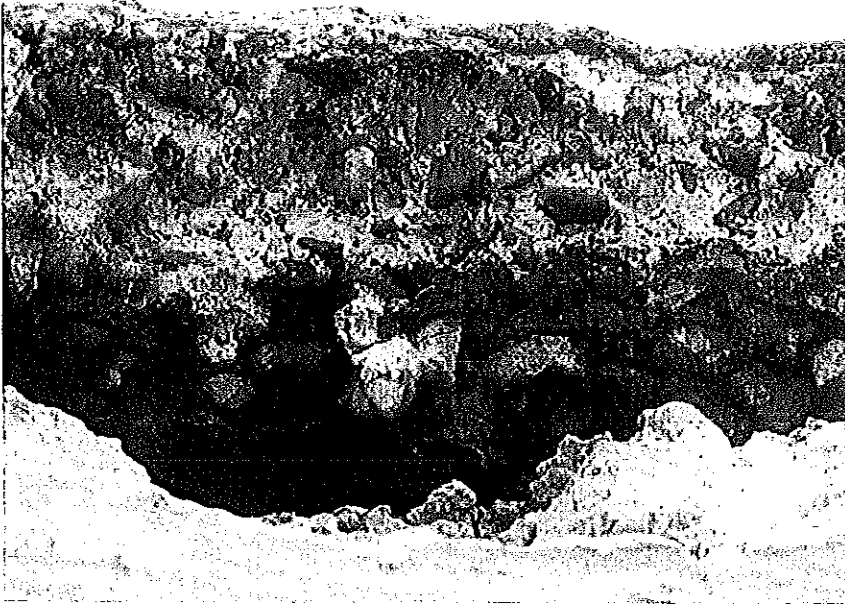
Close-up view of spall on wall-to-cap transition at north end of Tank 2. Note the rusted diamond steel mesh reinforcement.
